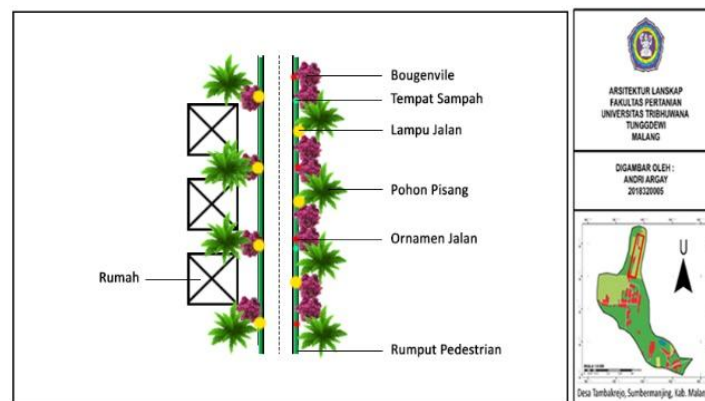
Road Site Plan of the Northern Part of Sendang Biru Hamlet
